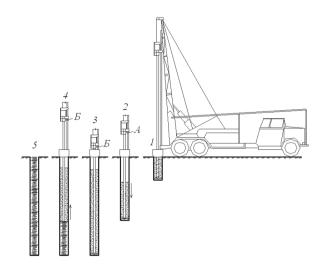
Technological scheme for the construction of soil-cement piles using the Deep Soil Mixing method:
